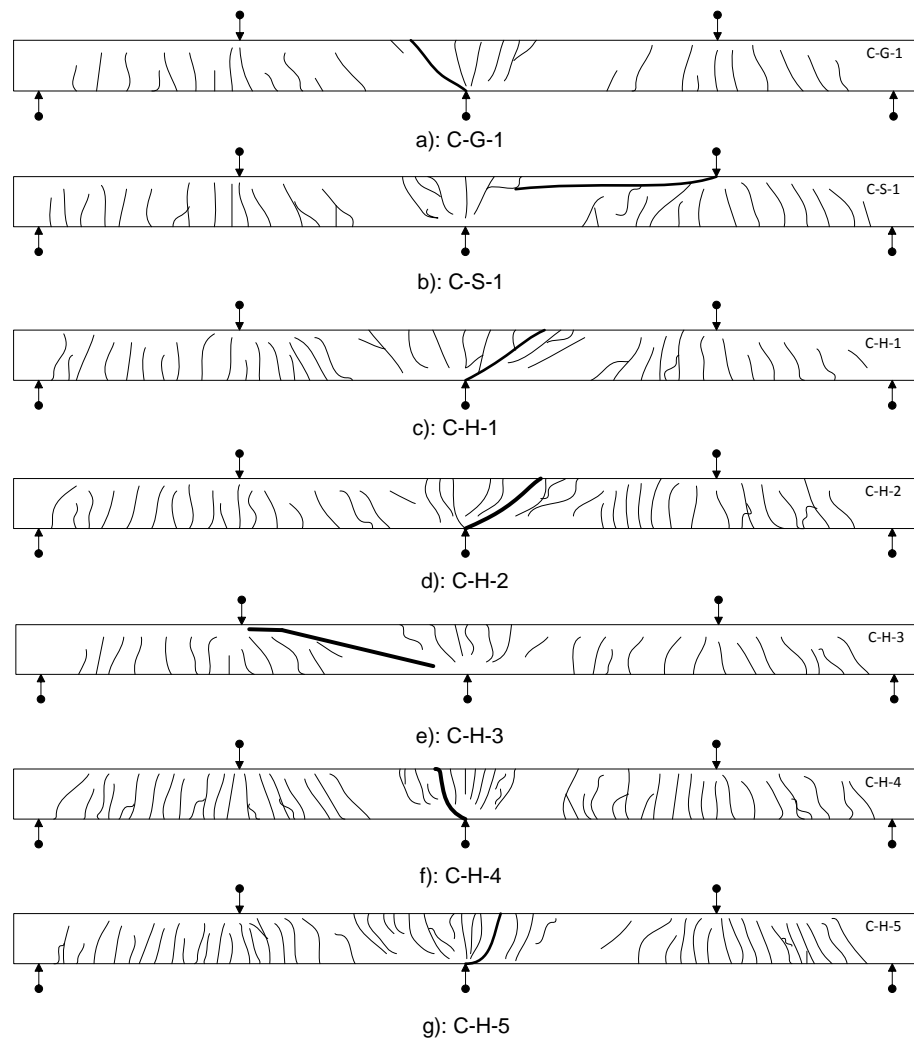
Crack patterns at failure of continuous concrete beams tested
